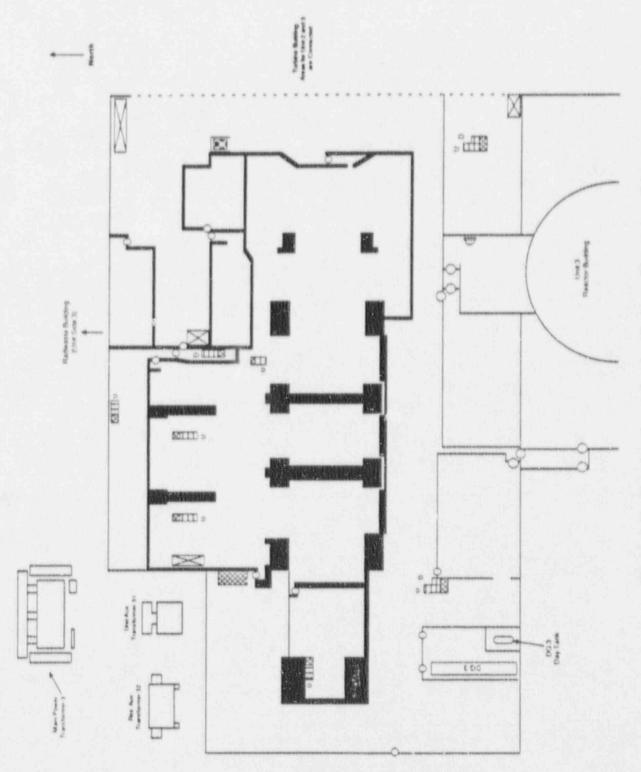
Dresden (-1.3 Turbine Building Elevation 517'-6"
